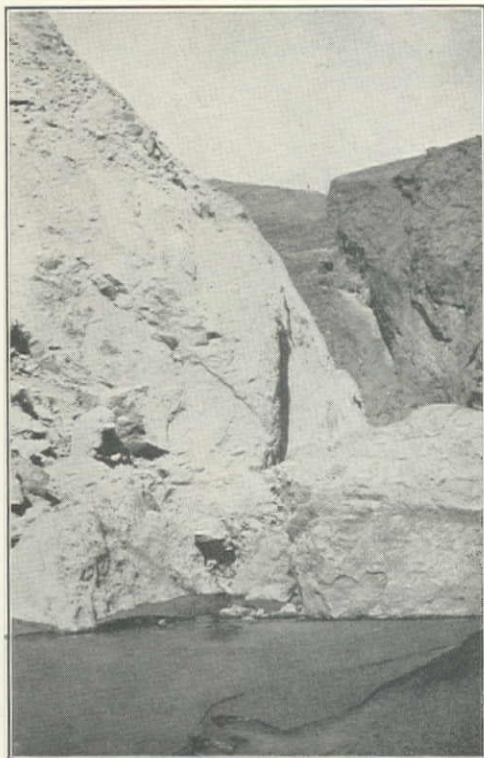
North Abutment, Looking Upstream. Pile of Rocks in Left Background Was Formerly Part of Dam
